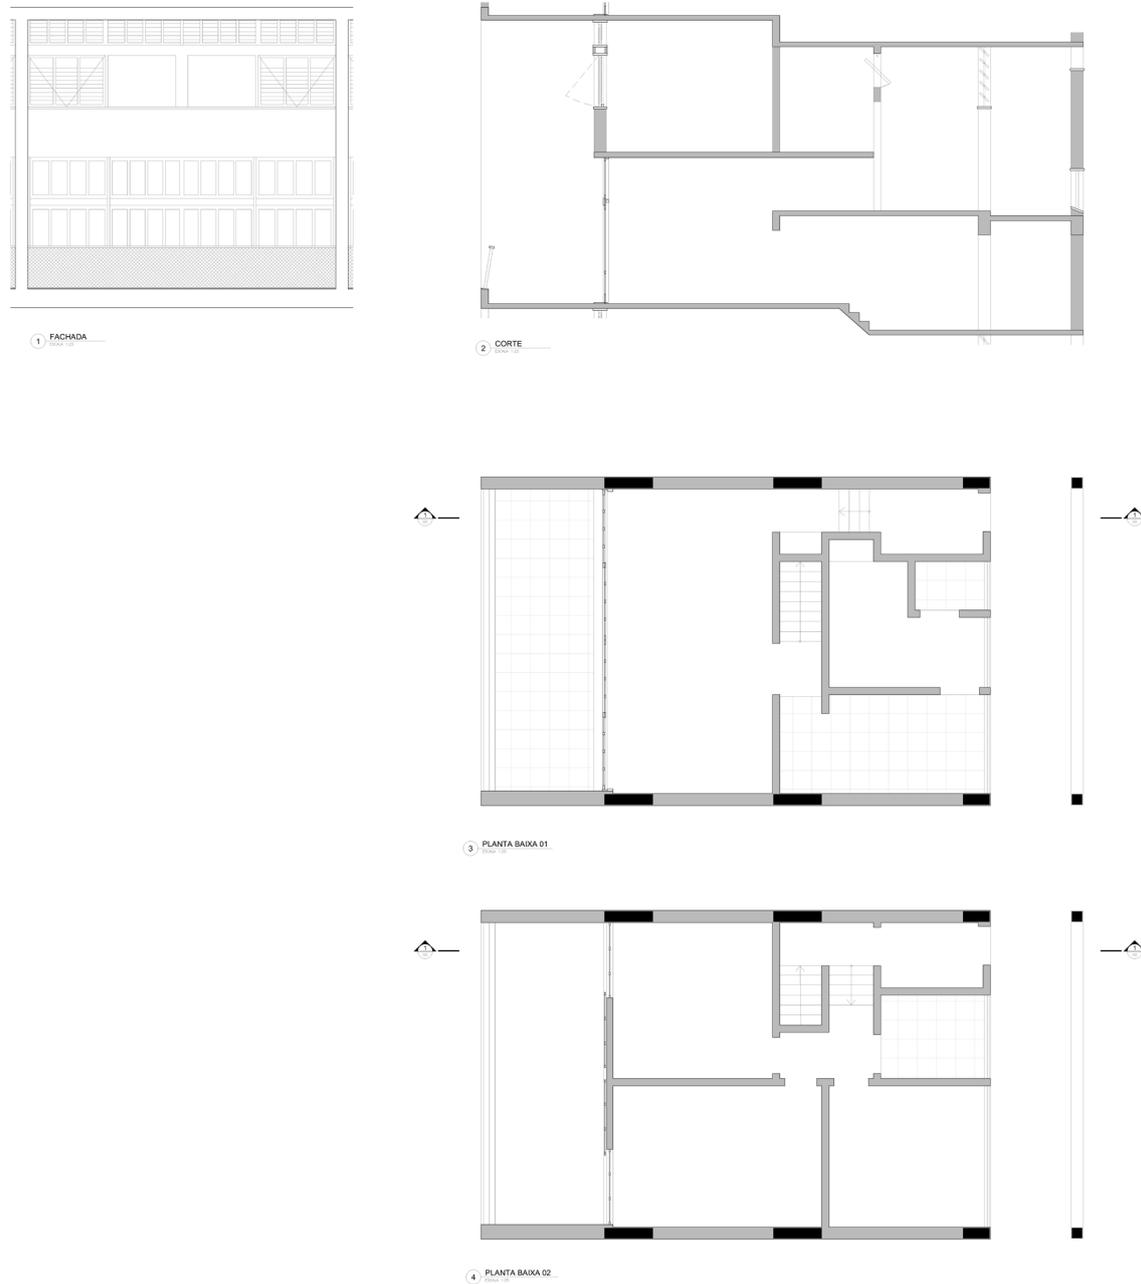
Julio Barros Barreto, stretch of façade, section and plans
